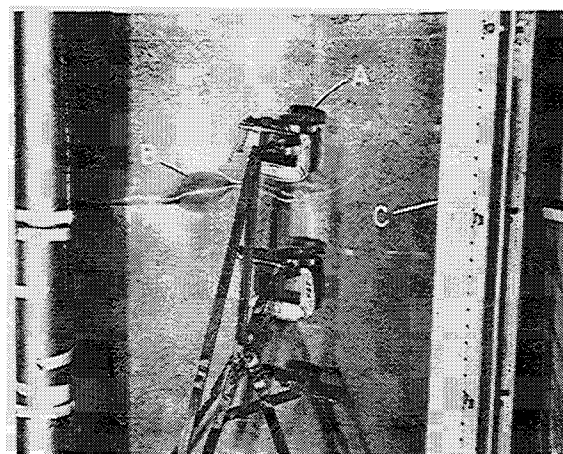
Compressive buckling failure of thin curved panels: A, dial gage; B, buckle after panel collapse (panel 3); C, side grip.
